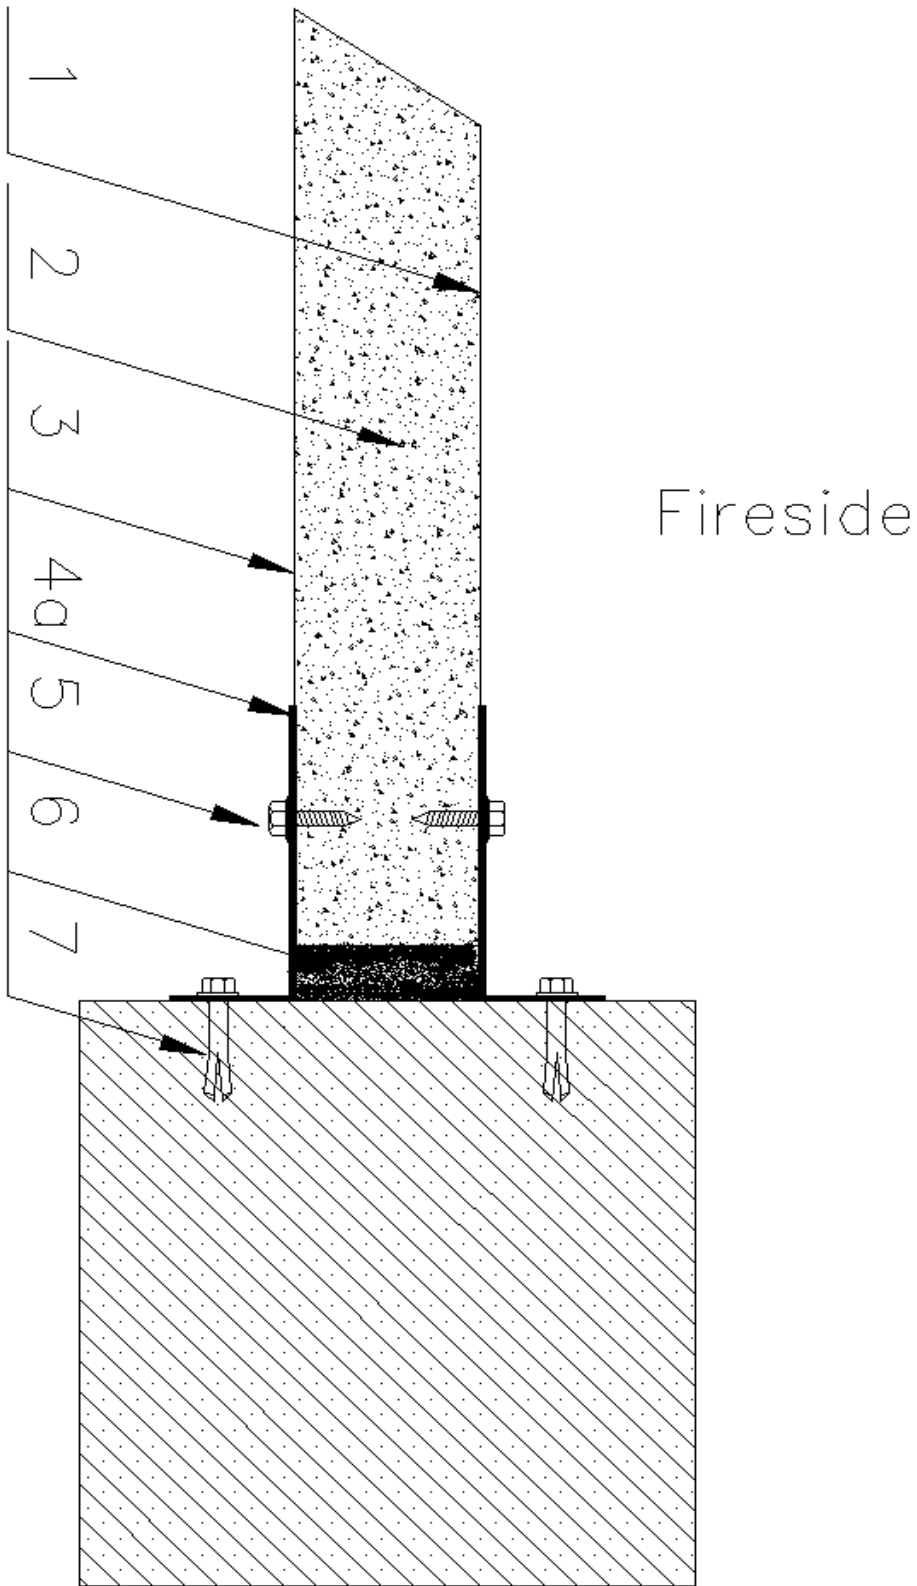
Section panel fixing A at the bottom concrete lining of the test frame
